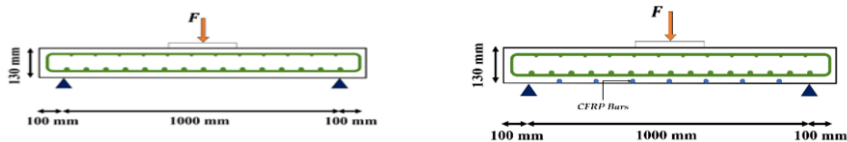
Typical slab specimen (Left) Control slab without strengthening, (Right) Strengthened Slabs with CFRP
